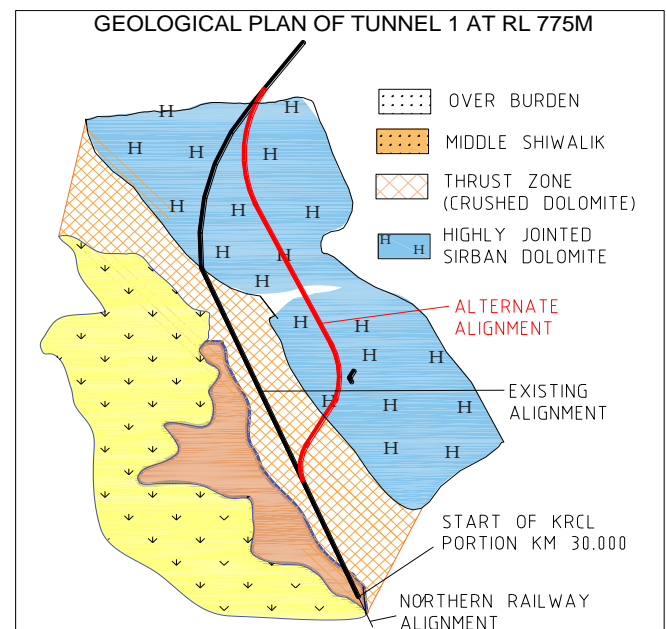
Geological plan at elevation 775m showing existing & proposed alternate alignment of tunnel T1 and tunnel T2.
